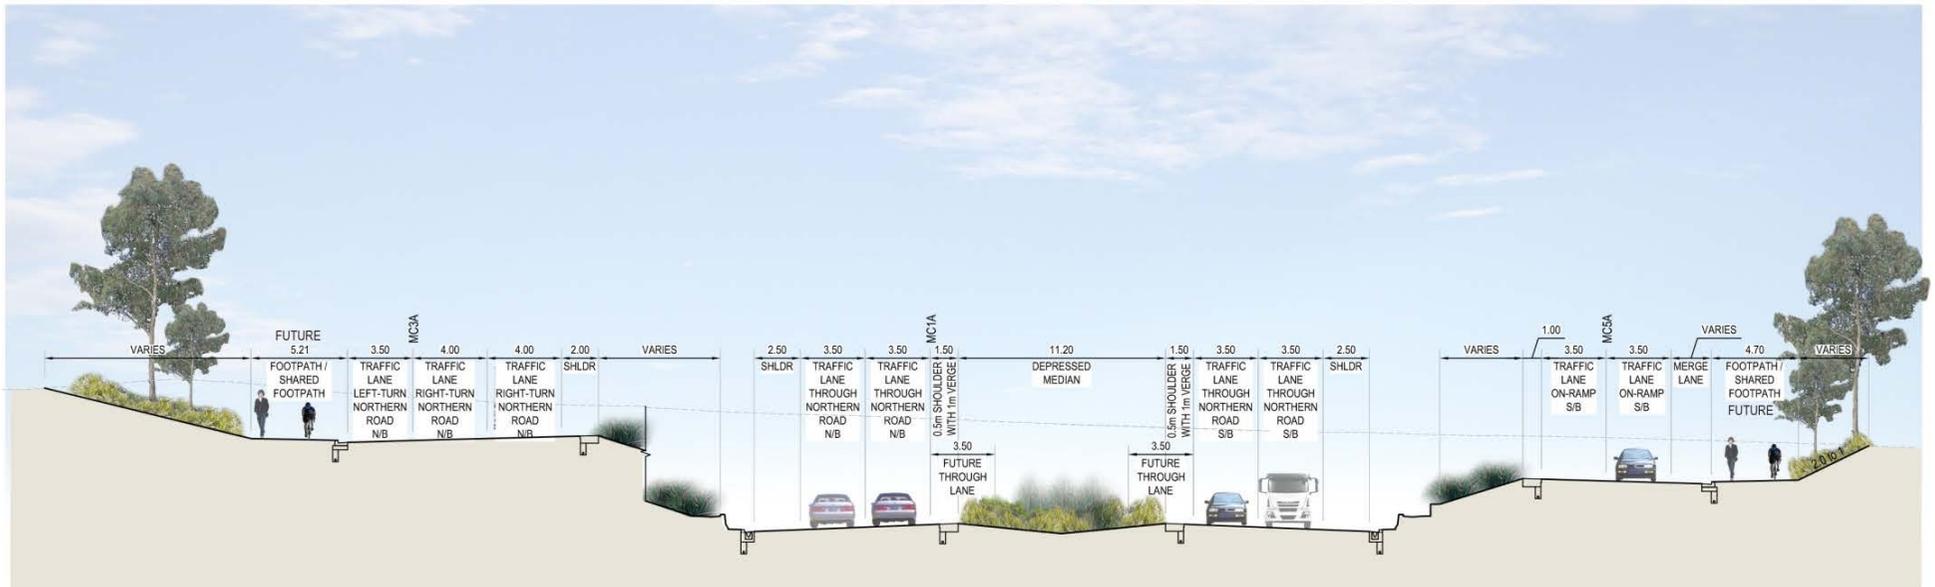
Typical cross section – The Northern Road (in the cutting)
